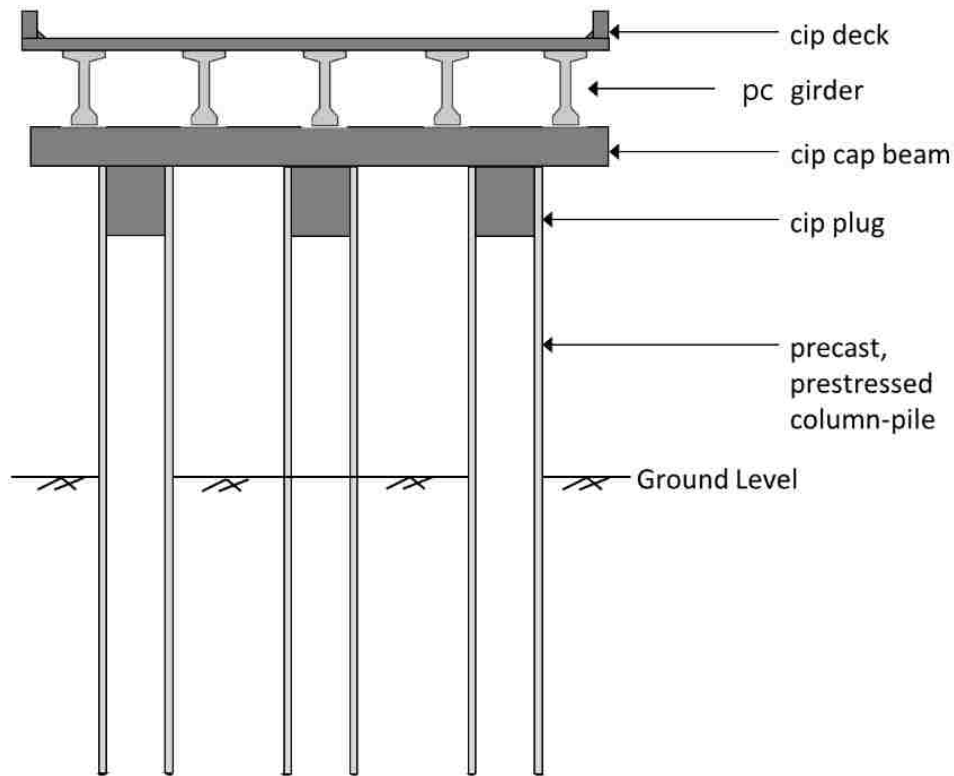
Typical section of bridge founded on hollow prestressed concrete pile-columns
